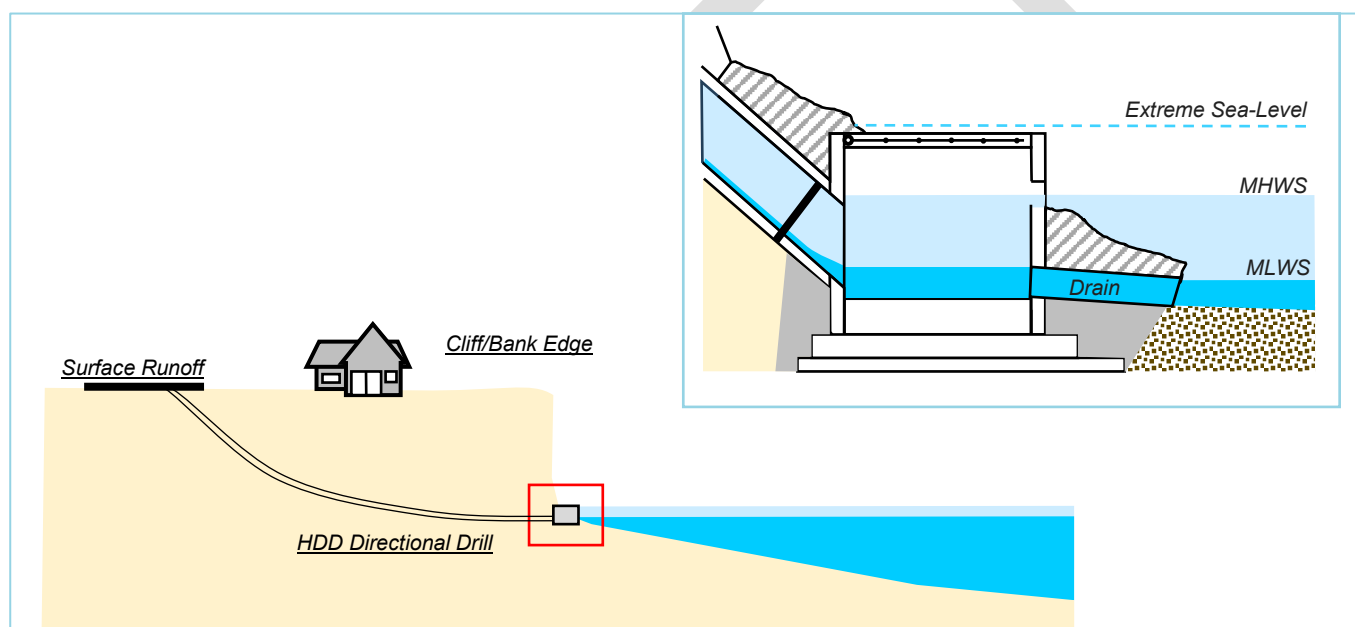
Schematic surge chamber-outlet manhole section sketch
